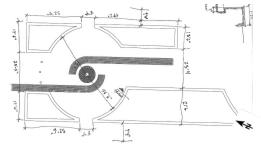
Existing Project Site, Plan View (provided by Selser Schaefer Architects)
